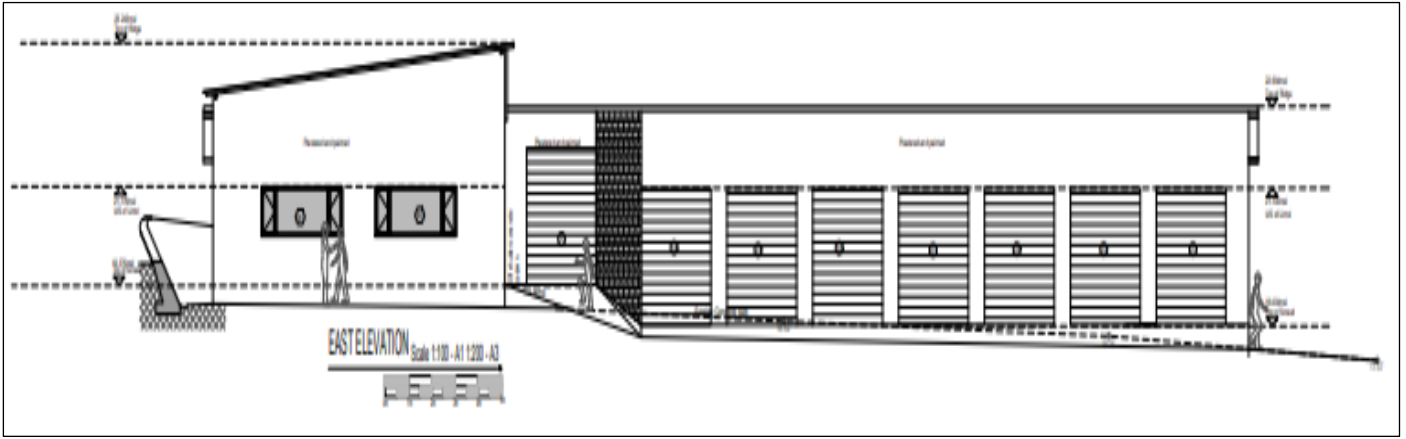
East elevation of the proposed new garages (TMBA, 2023)
